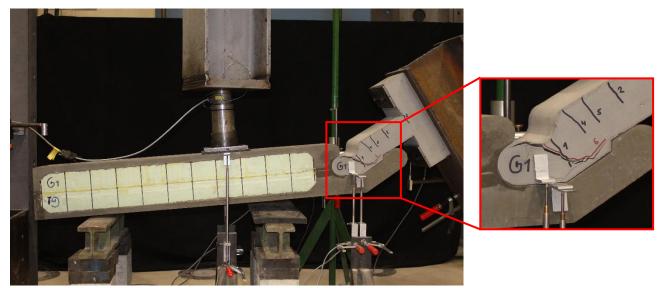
testing of the prototype in erected condition, failure of the adapter part (foundation)
